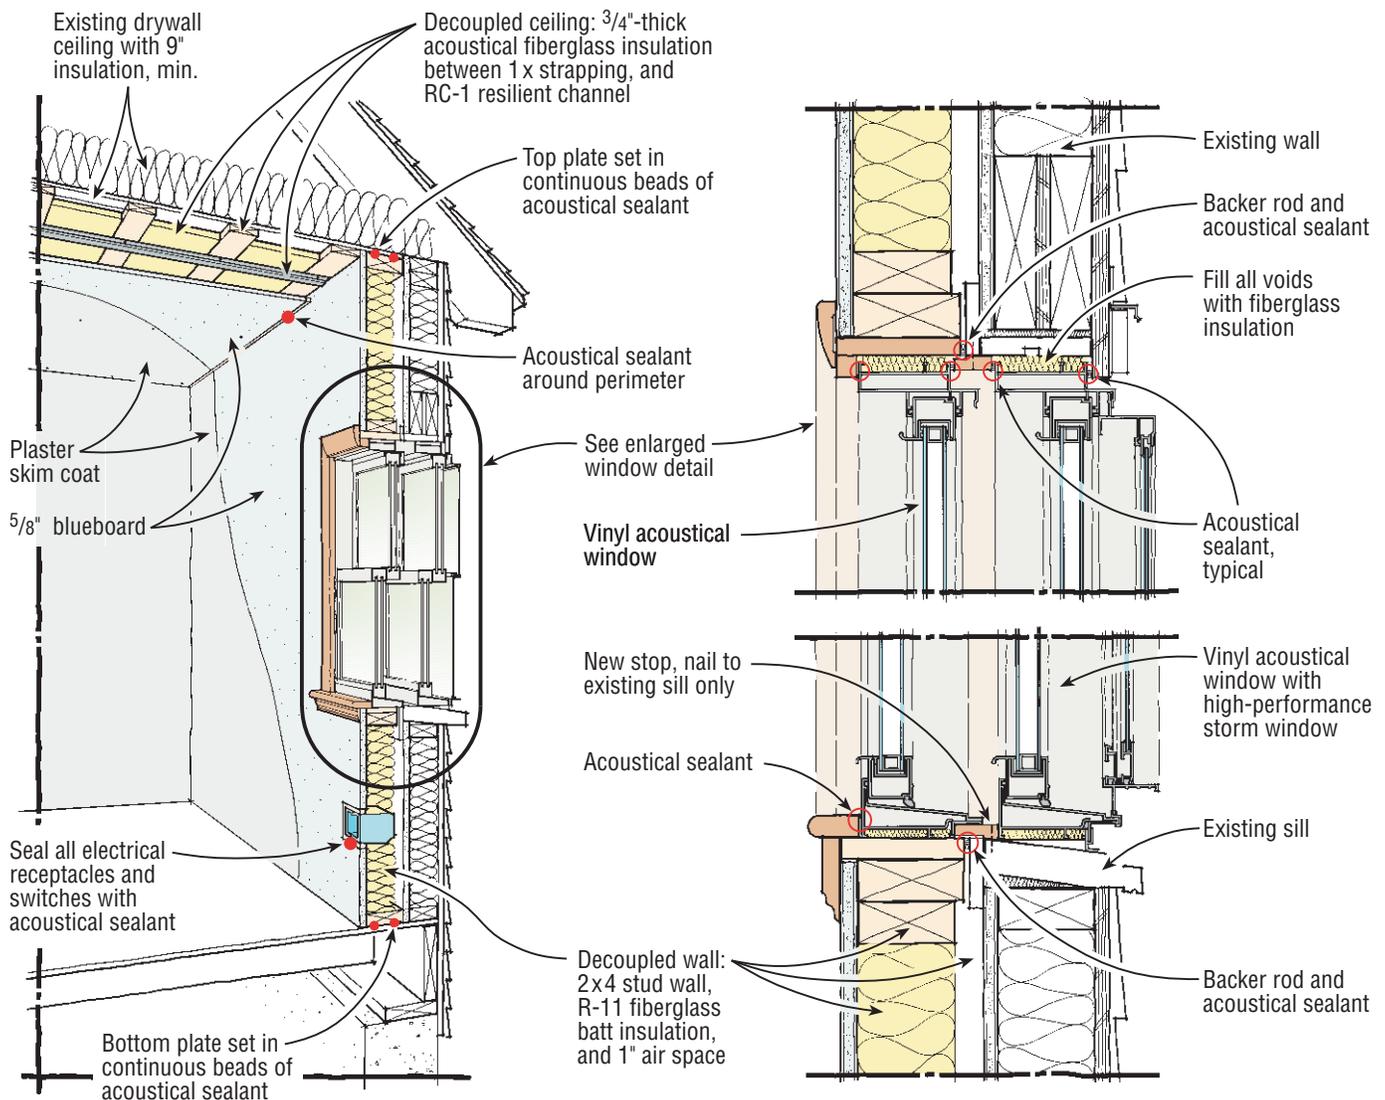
Double wall and ceiling construction decouples, or isolates, the interior space from the exterior building envelope. Although the existing room size is slightly reduced, the thunder of a passing jet is lowered to background noise.
